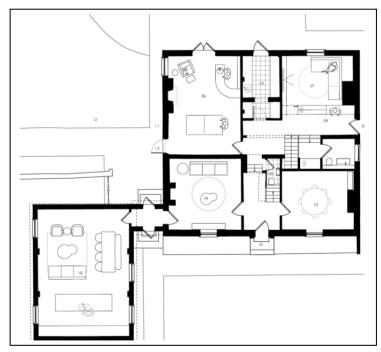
Approved ground floor plan under LA Ref: E/23/020238/LBC showing modern extensions to the east removed
